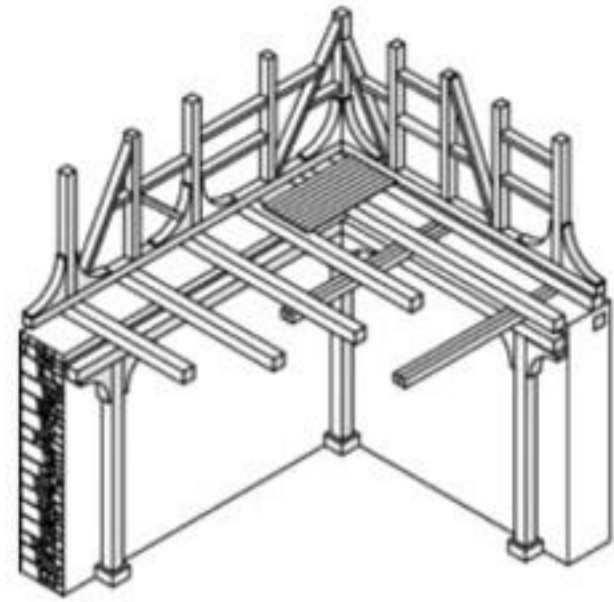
Building structure of Lefkada traditional house. (credits: D. Omar Sidik).
